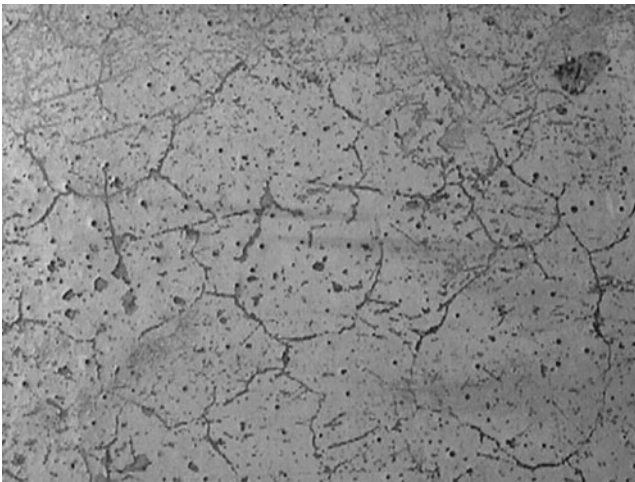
Plastic shrinkage cracking in freshly placed concrete. [Photograph courtesy of Carlos Vidella.]
